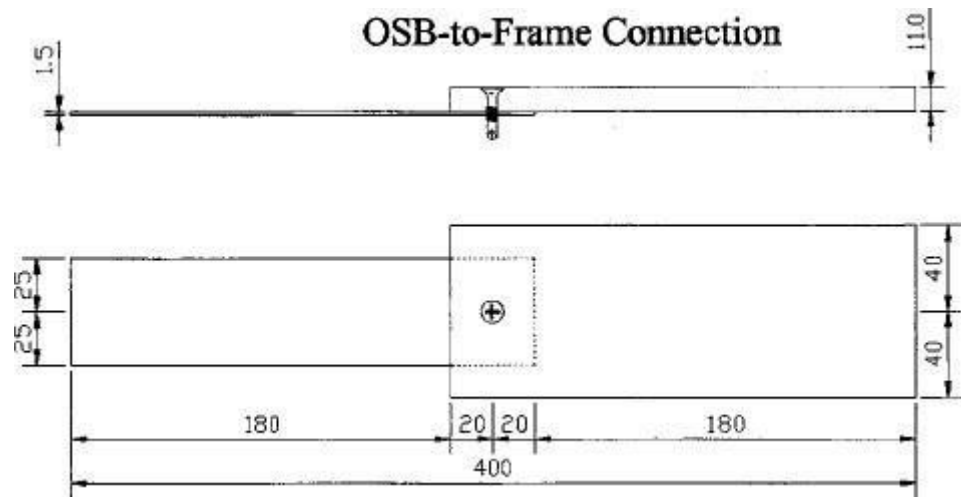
Tested OSB-to-steel skeleton connections. [11]
